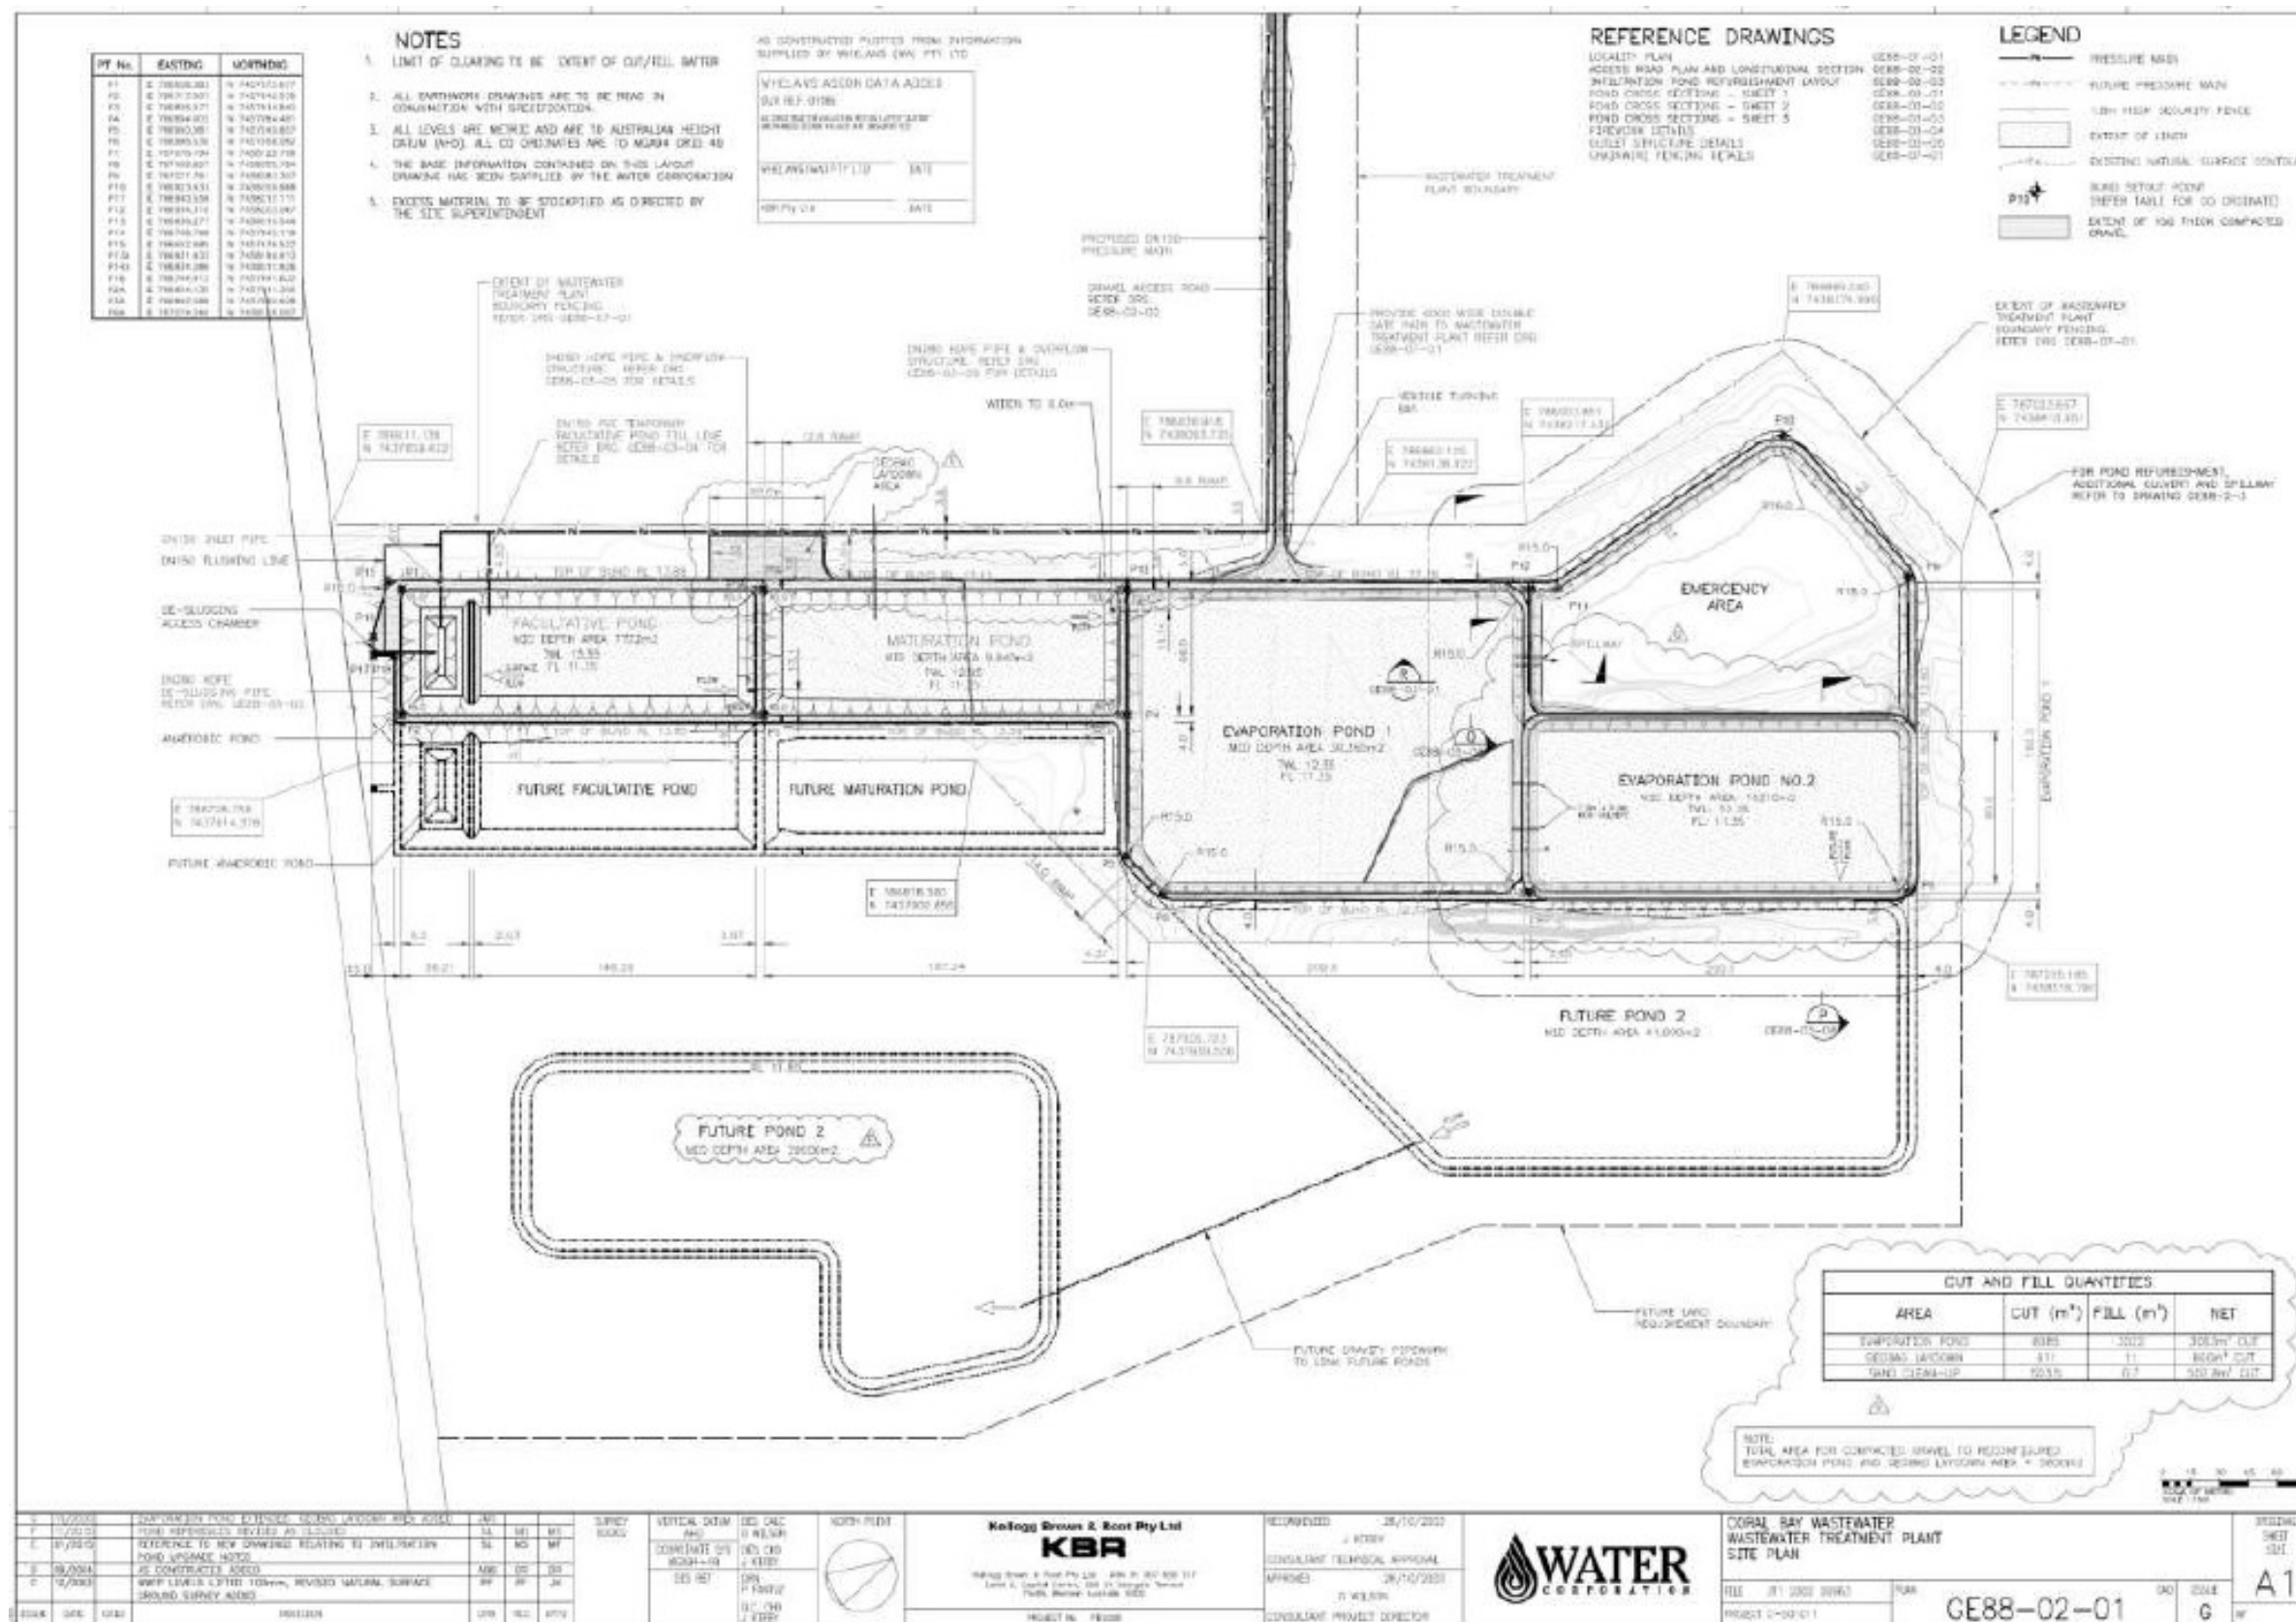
Coral Bay Wastewater Treatment Plant site – plan GE88-02-01
